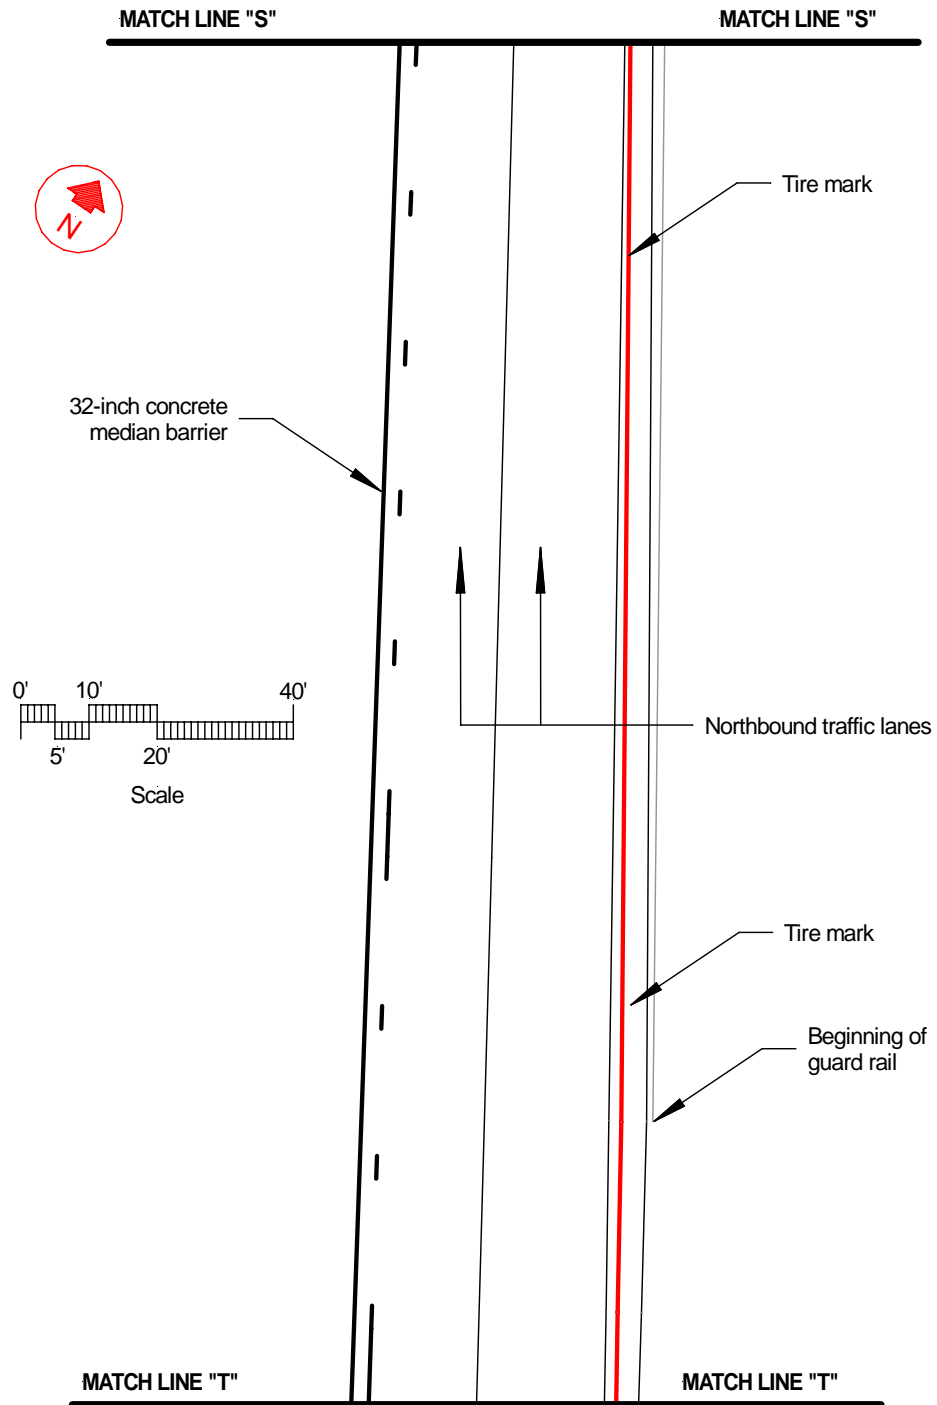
NTSB map of S-T pavement markings and roadway evidence.
